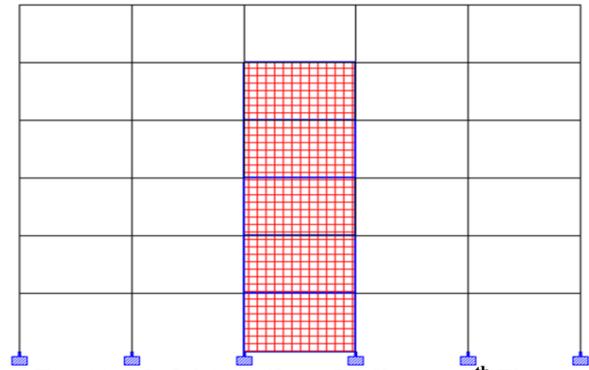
Model 11 – Shear Wall up to 5th Floor
